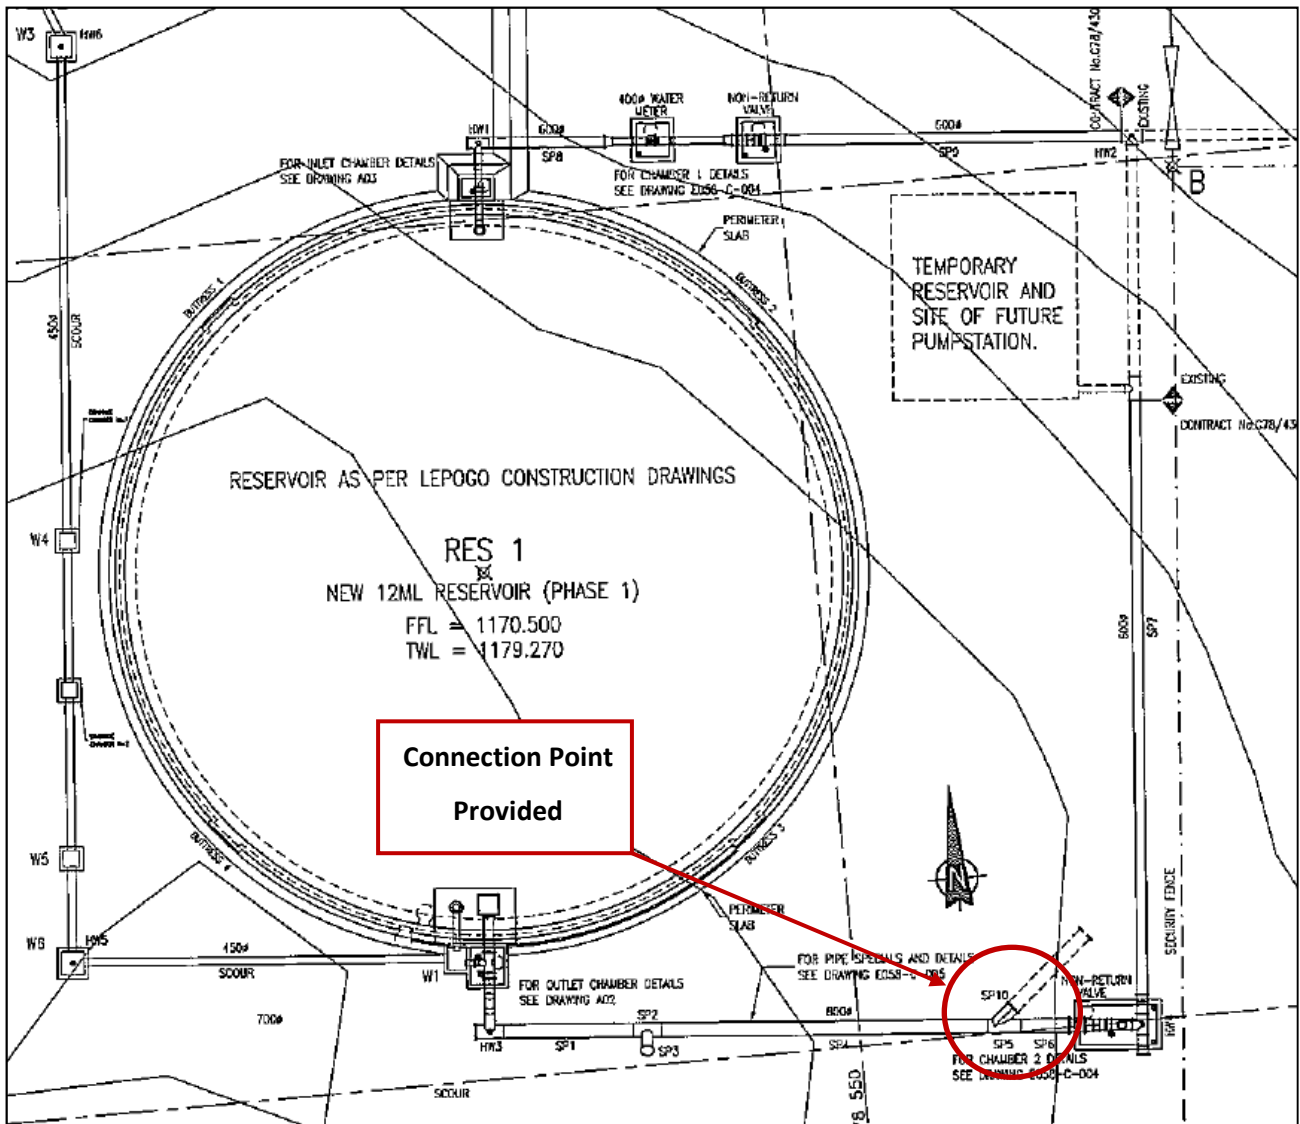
As-built Drawing of Hammanskraal West Reservoir
